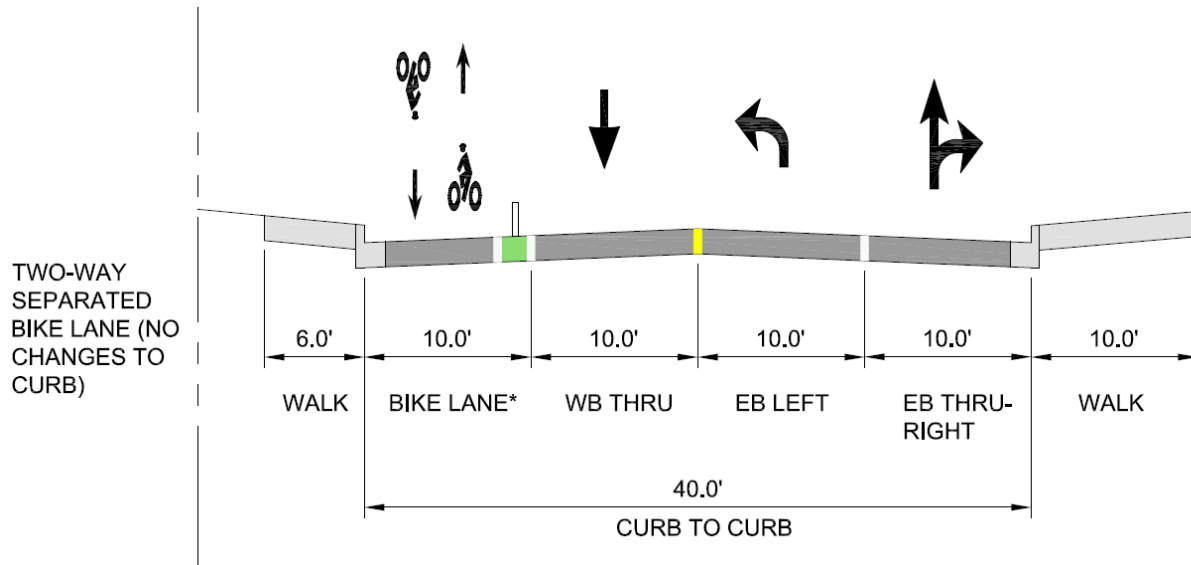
Proposed Cross-Section Option A; McClellan Road West of Bubb Road
